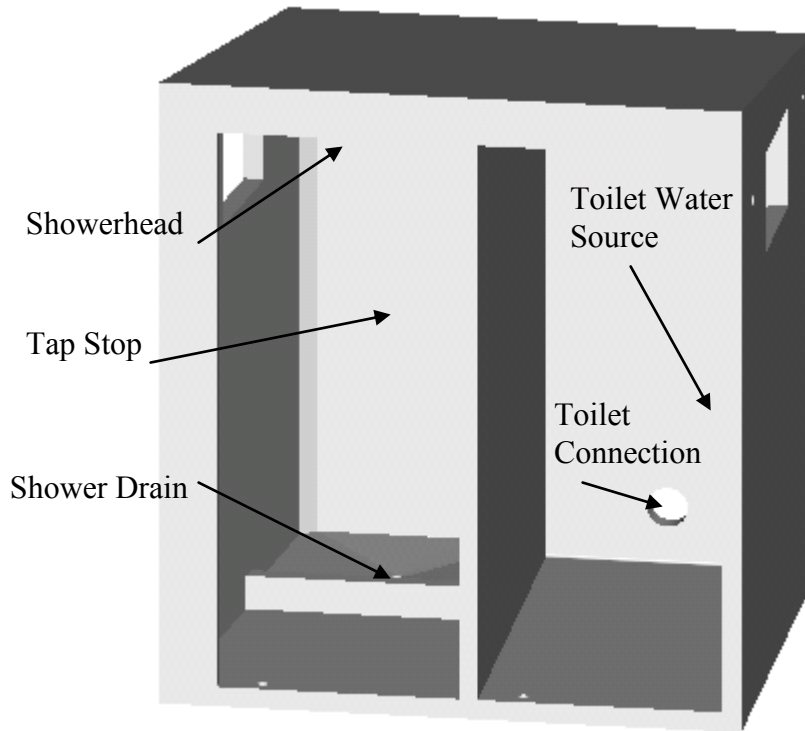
Inside layout of facility for shower and wet toilet (shower on left, toilet on right)
